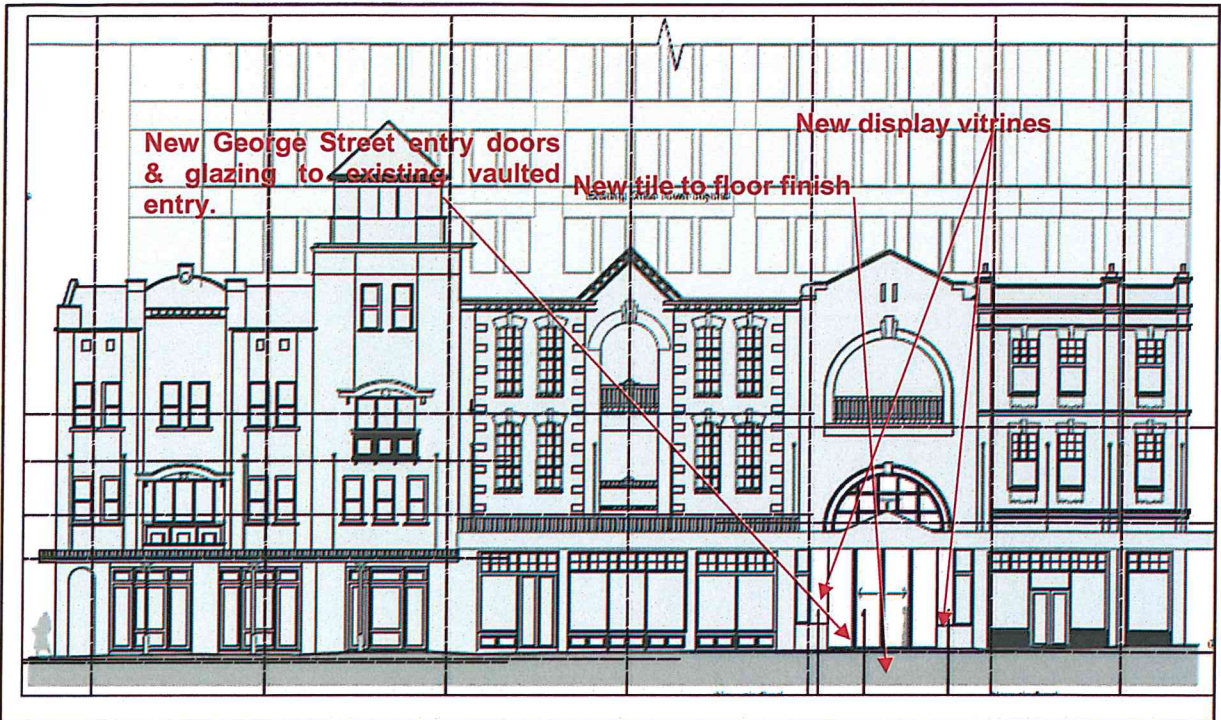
George Street elevation- new entry doors and display vitrines (Source: PMDL)
